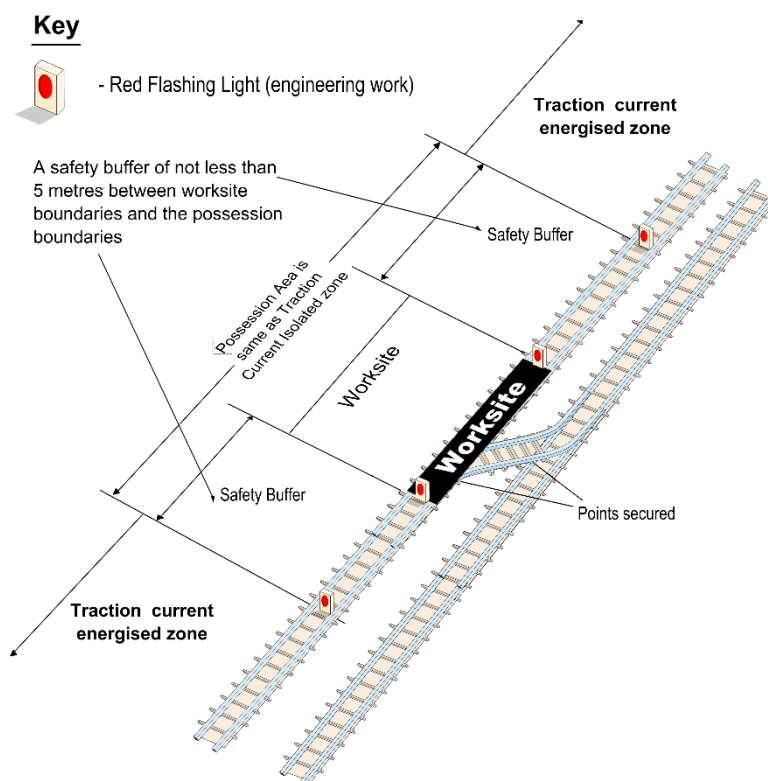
Protection: Depots (require isolation and earthing of overhead line equipment)
